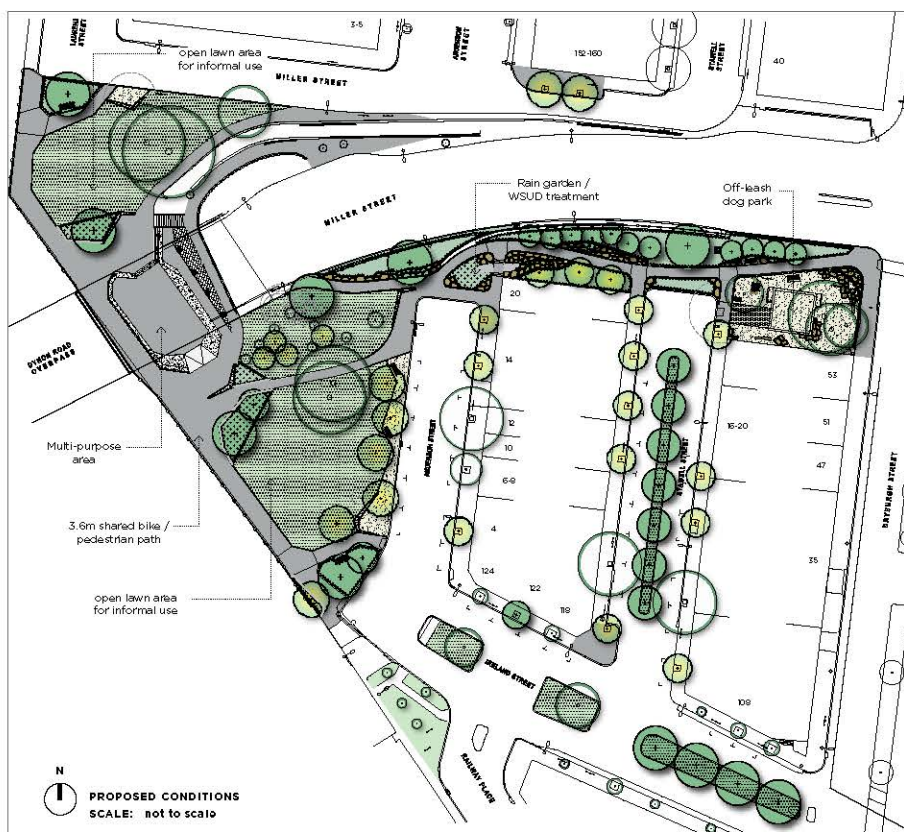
Proposed expansion of Railway Place and Miller Street Reserve
